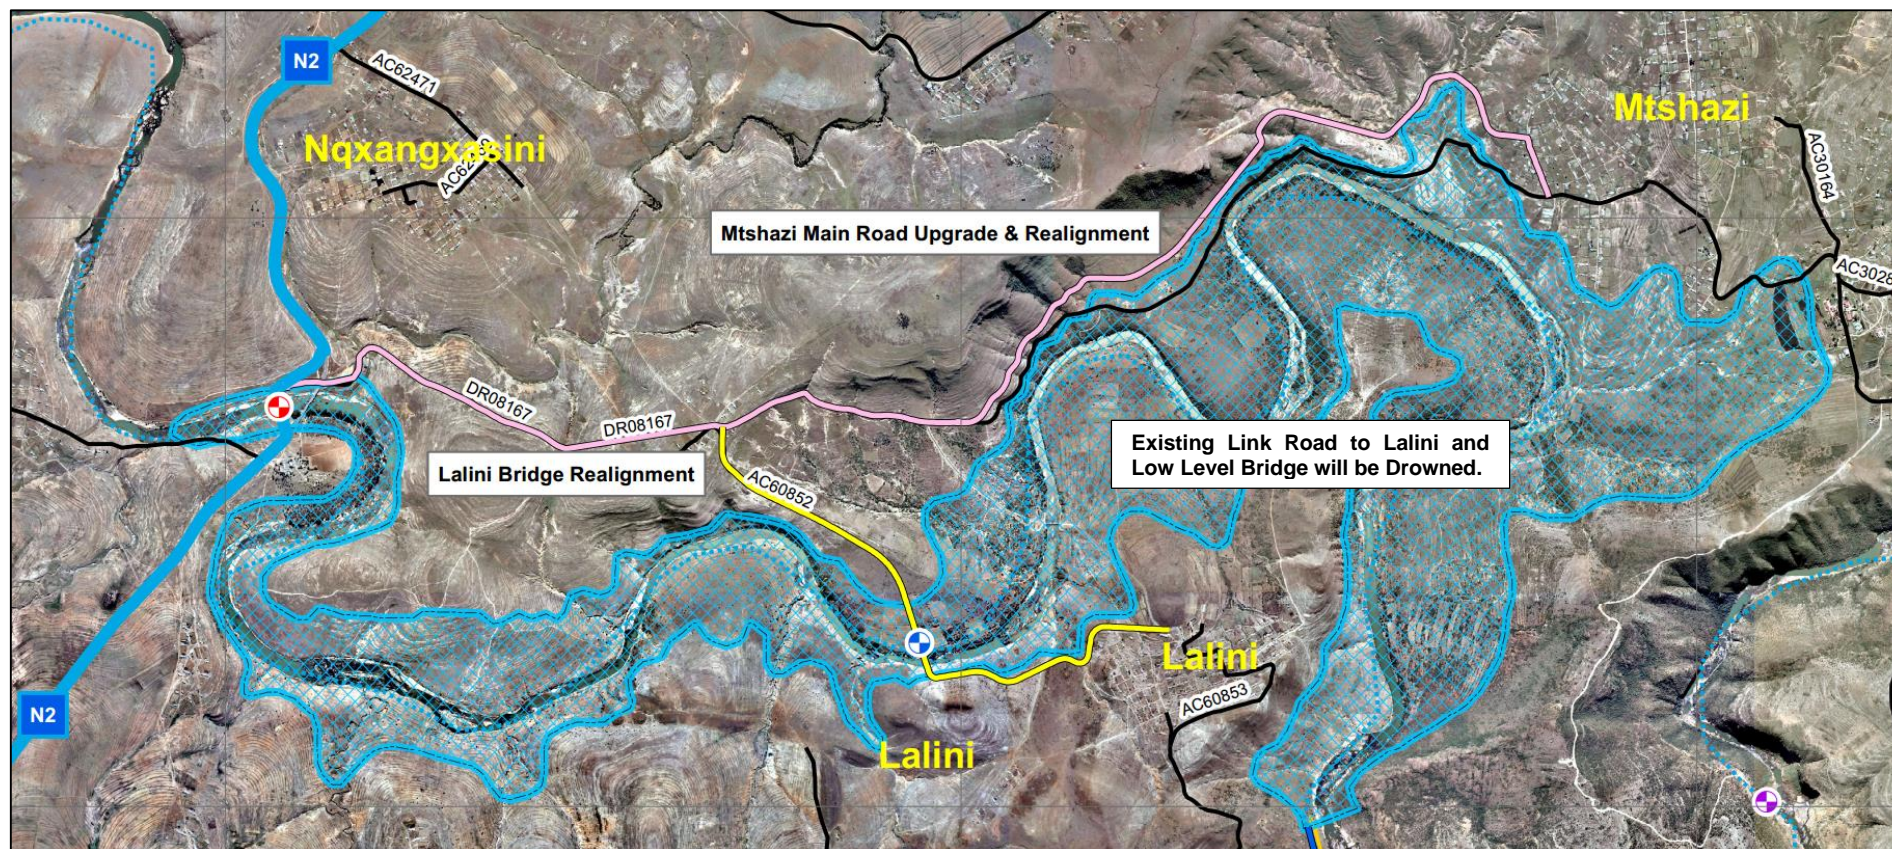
Roads and Bridges to be Permanently Upgraded and Realignment Before and During Construction
